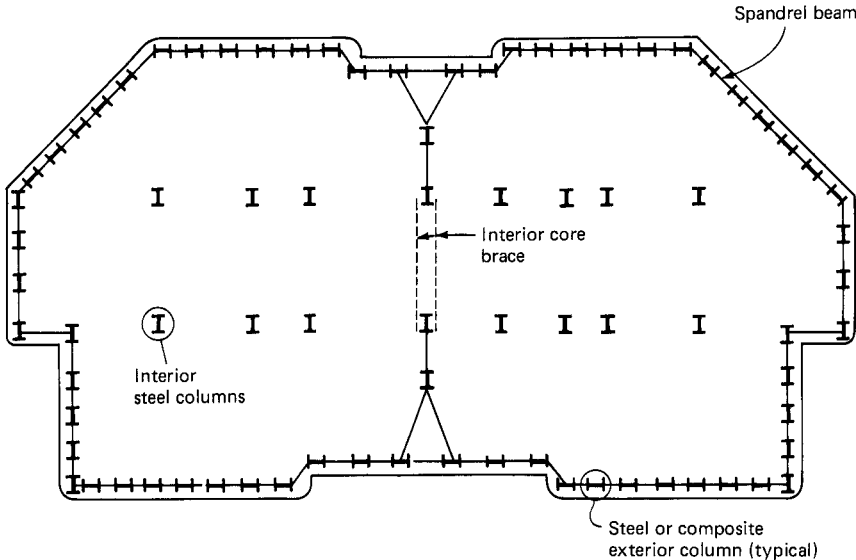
Twin tube system with 10-ft (3-m) column spacing.
